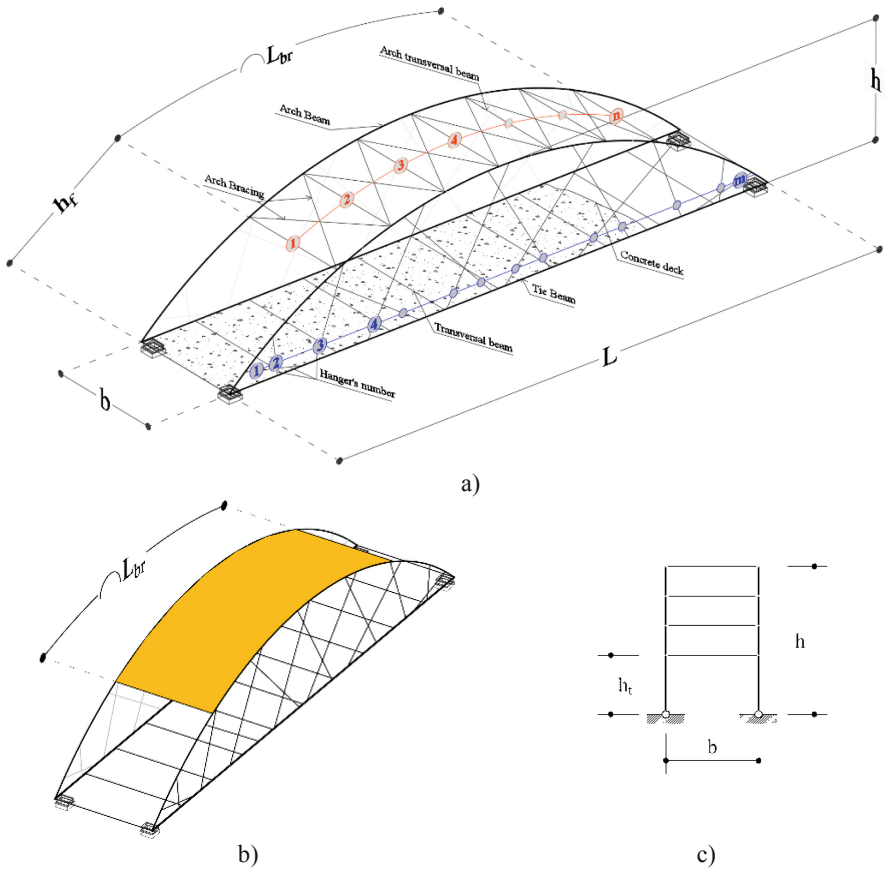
Generic network arch bridge considered in the study: (a) 3D view of the network arch bridge with structural elements; (b) braced zone of the arch; (c) Front view of the arch
